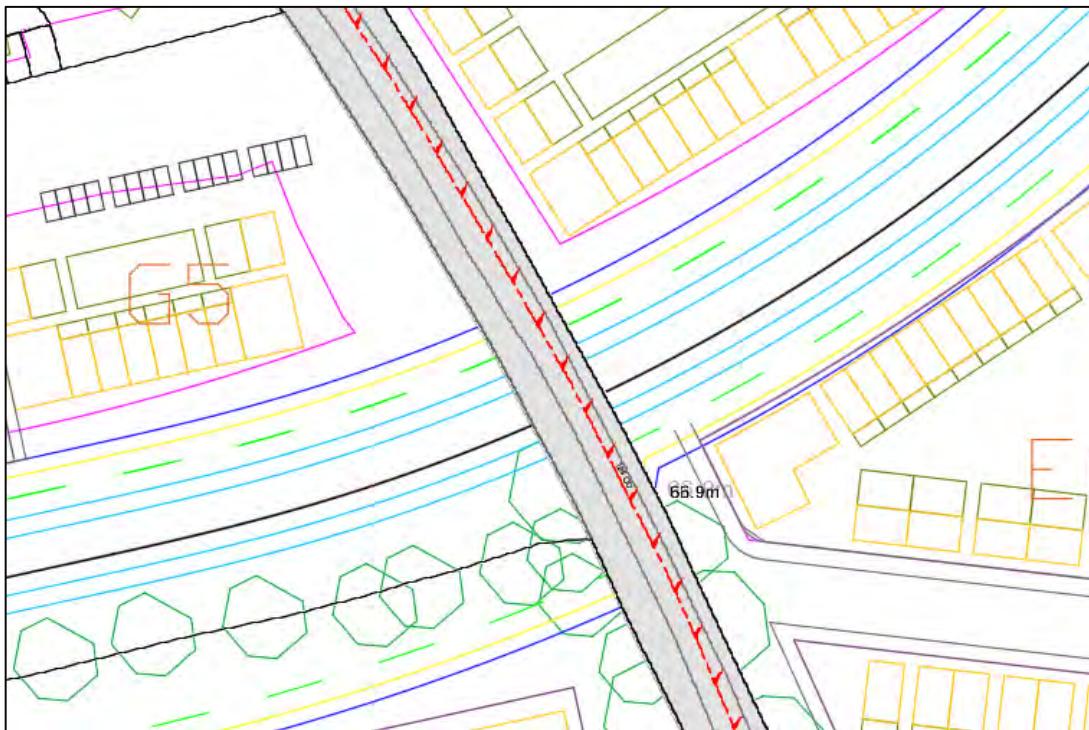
Thames Water Assets Overlaid with Development Proposals – Intersection of Proposed Phase 1B Crawley Western Link Road and Existing Rusper Road
